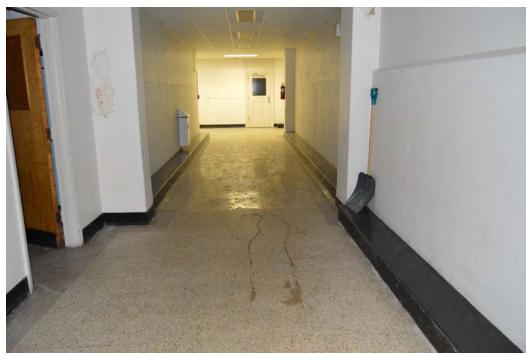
North-south corridor in wing's basement, looking from the cafeteria northward to the east-west basement corridor of the 1928 building
